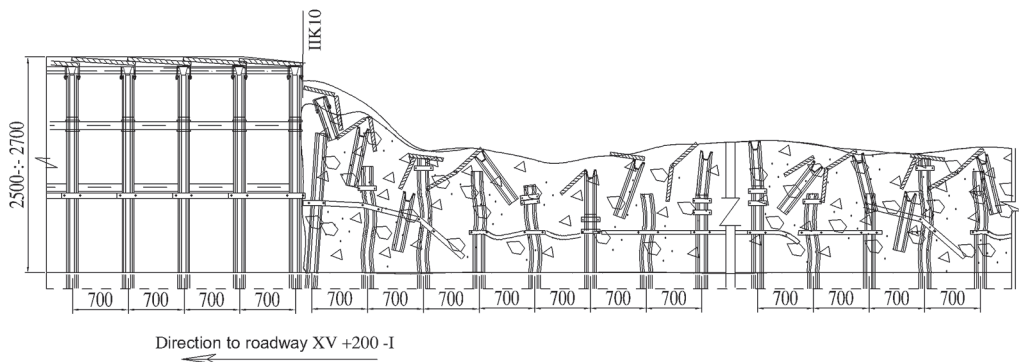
Current state longitudinal cross-section of the strike roadway at level +200, seam 6, before slashing and restoration (8)
